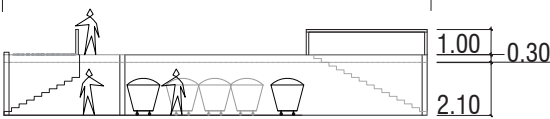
Section D-d of Sea Shell Shack (m). 16 steps, each 15 cm in height. The building is 2.40 meters tall, 3.40 including the handrail.
